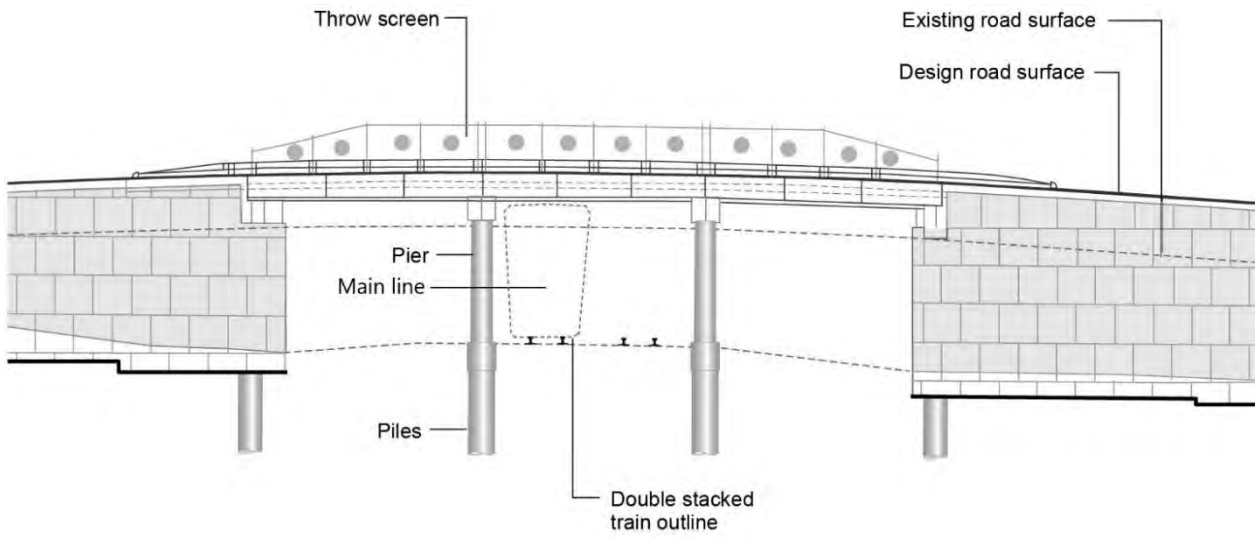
INDICATIVE EDMONDSON STREET BRIDGE
